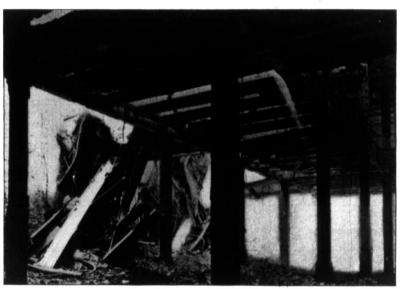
View on First Floor of Horne Store Damage done by felling water tank, " Compare with Plate 1 - steel work gluood stripped of the
